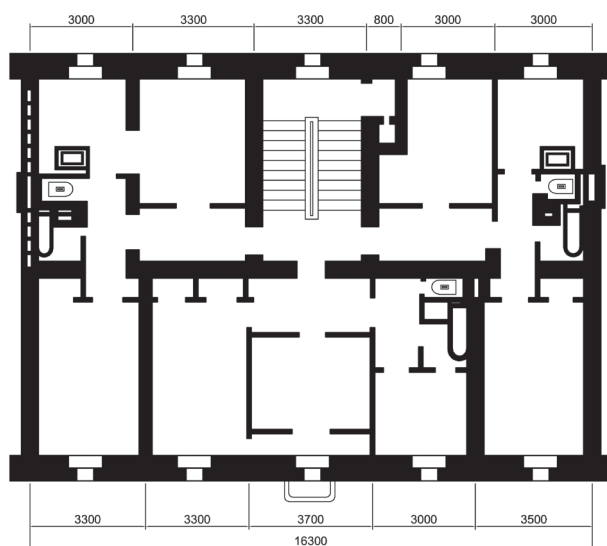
Sektsiia*-type floor plan for the Rodongja Apartment built in 1954
